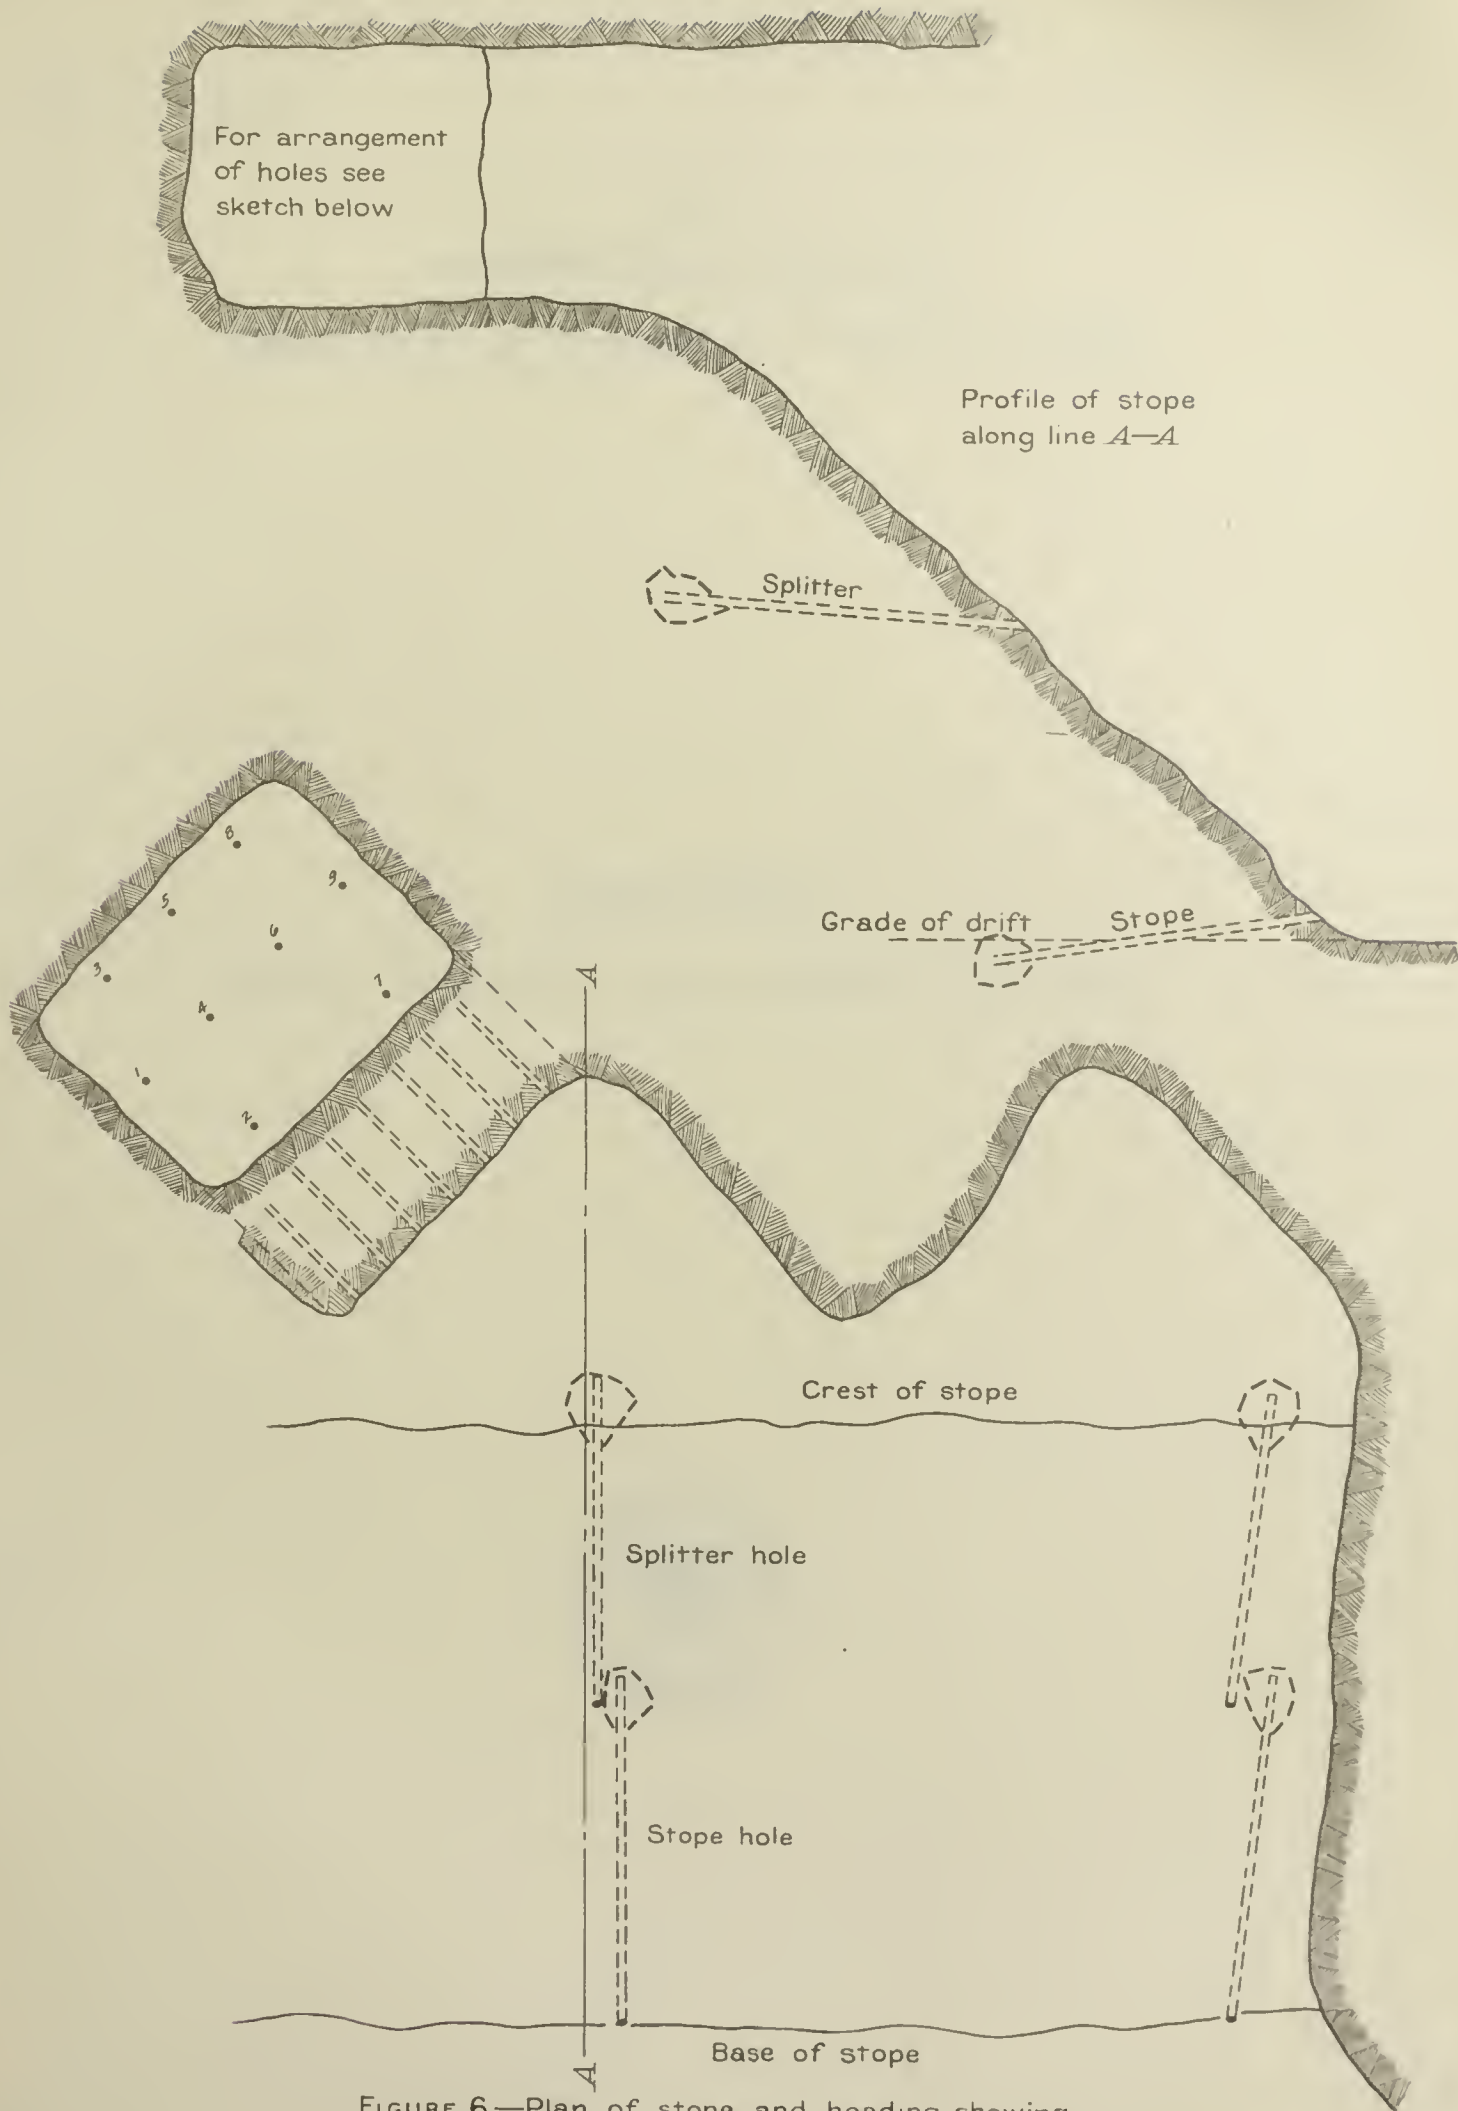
Plan of stope and heading, showing arrangement of holes
